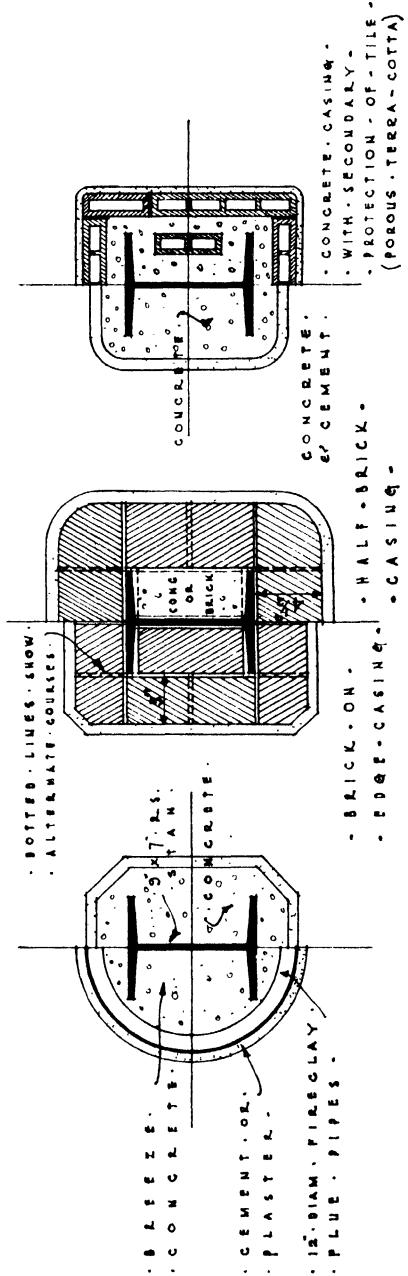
METHODS OF FIRE PROTECTION OF ROLLED-STEEL STANCHIONS WITH CONCRETE
